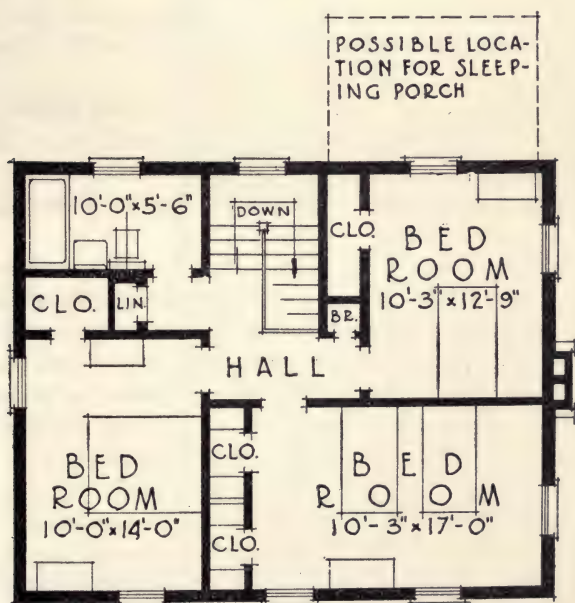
Second-floor plan. Ceiling height, 8 feet
